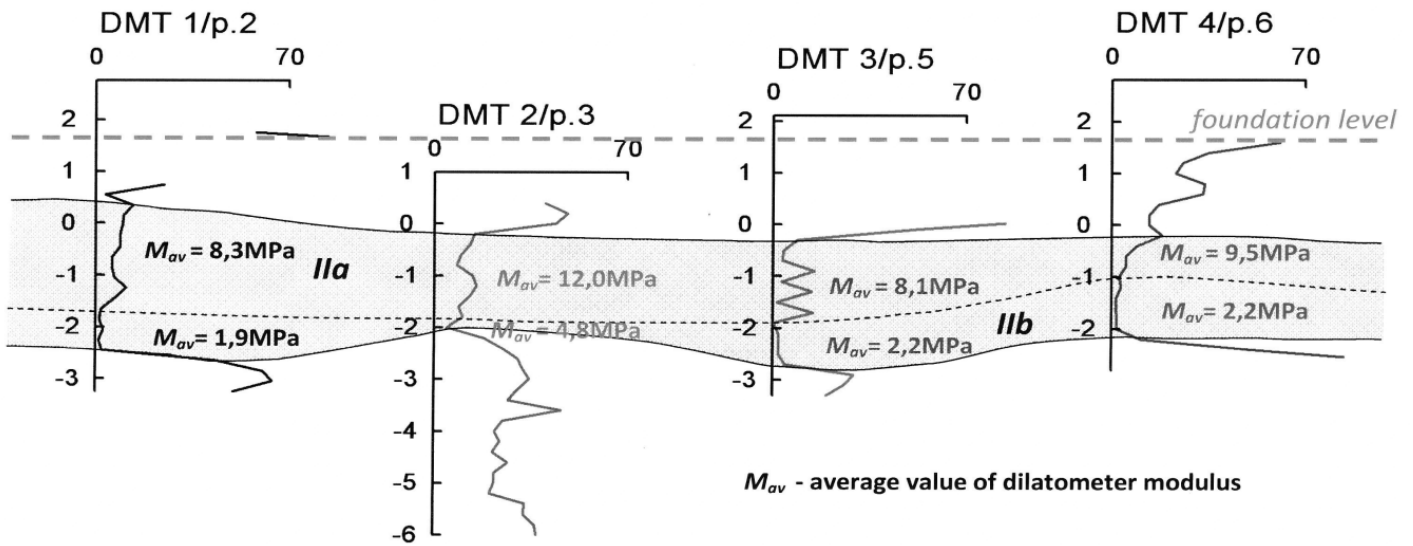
Geotechnical cross-section through the subsoil of the schoolhouse, a level of bedding and a course of aggragate mud were indicated (Godlewski 2011b).
